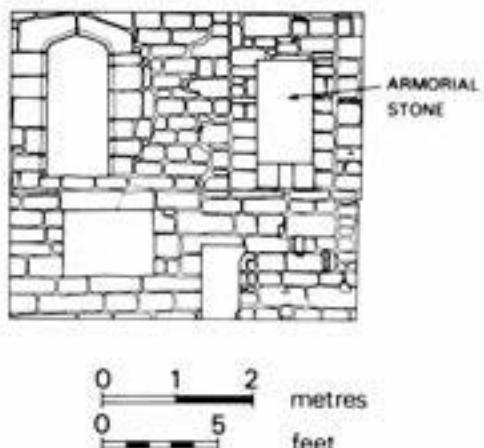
Internal elevation of the north wall of the Regimental Museum, ground floor
